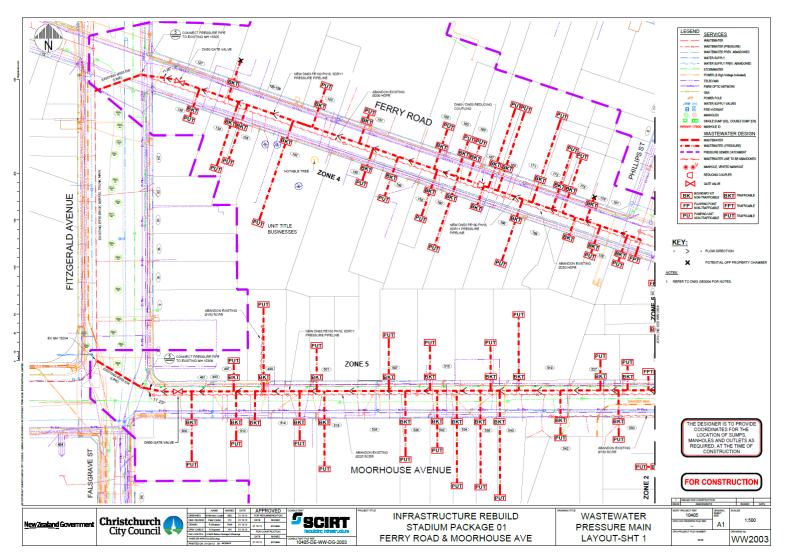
Design Drawing Example (WW Local Pressure Systems)
